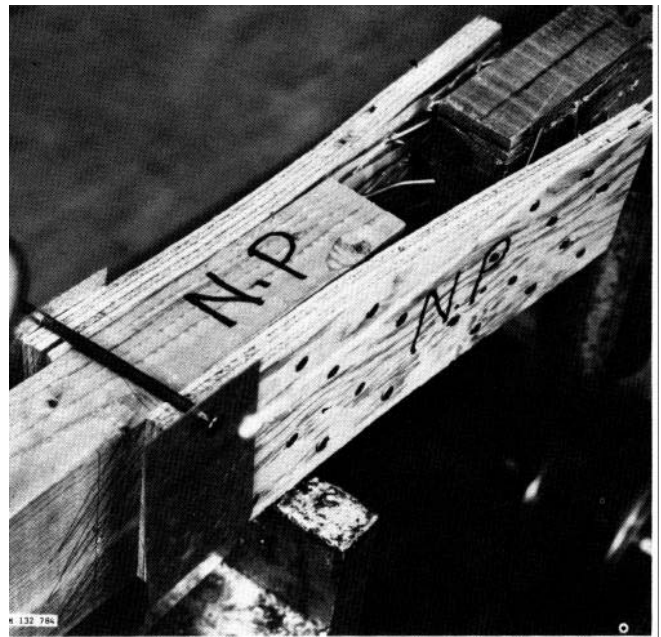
Failure of control trussed rafter with nailed plywood gussets. Failure was at the lower chord splice. (M 132784)
